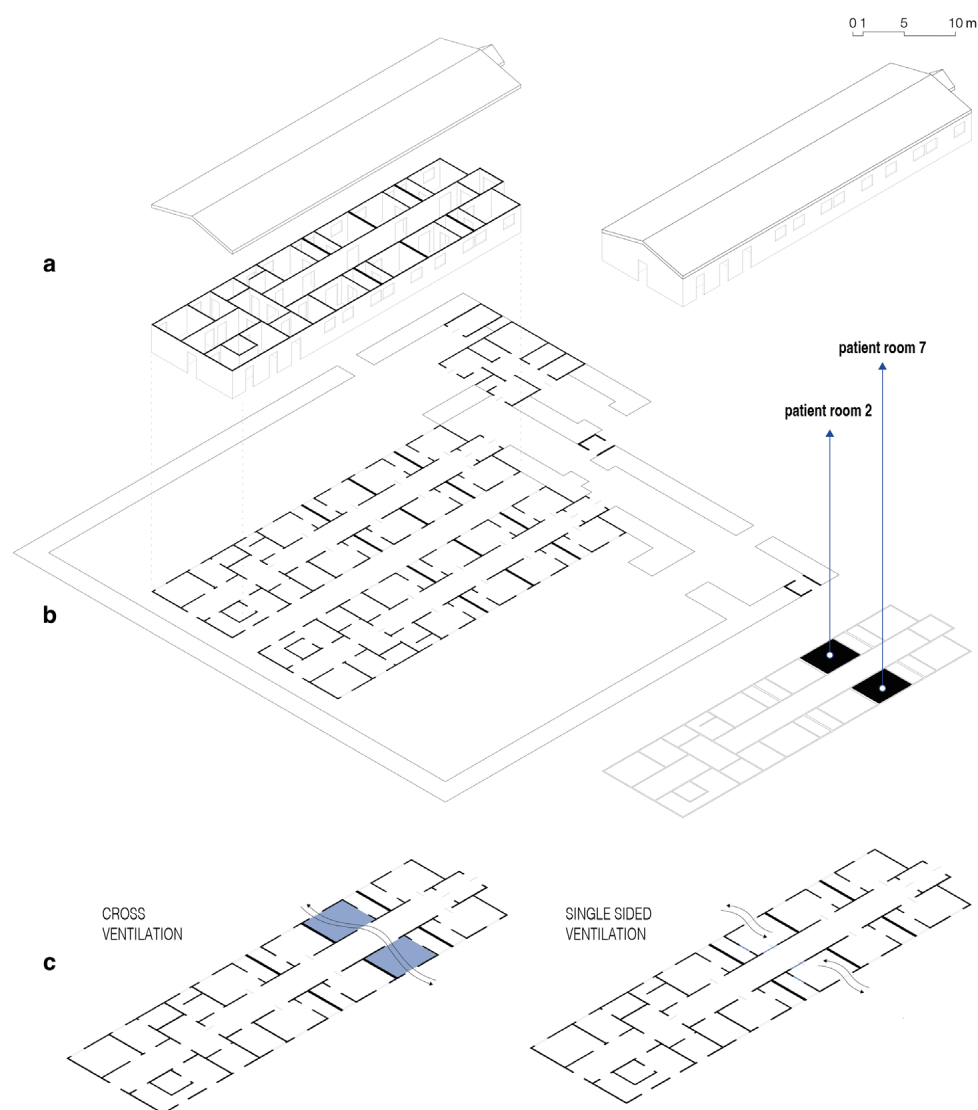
Case study 2, Man, Ivory Coast. (a) Three-dimensional view, (b) floor plan, (c) ventilation schemes.
